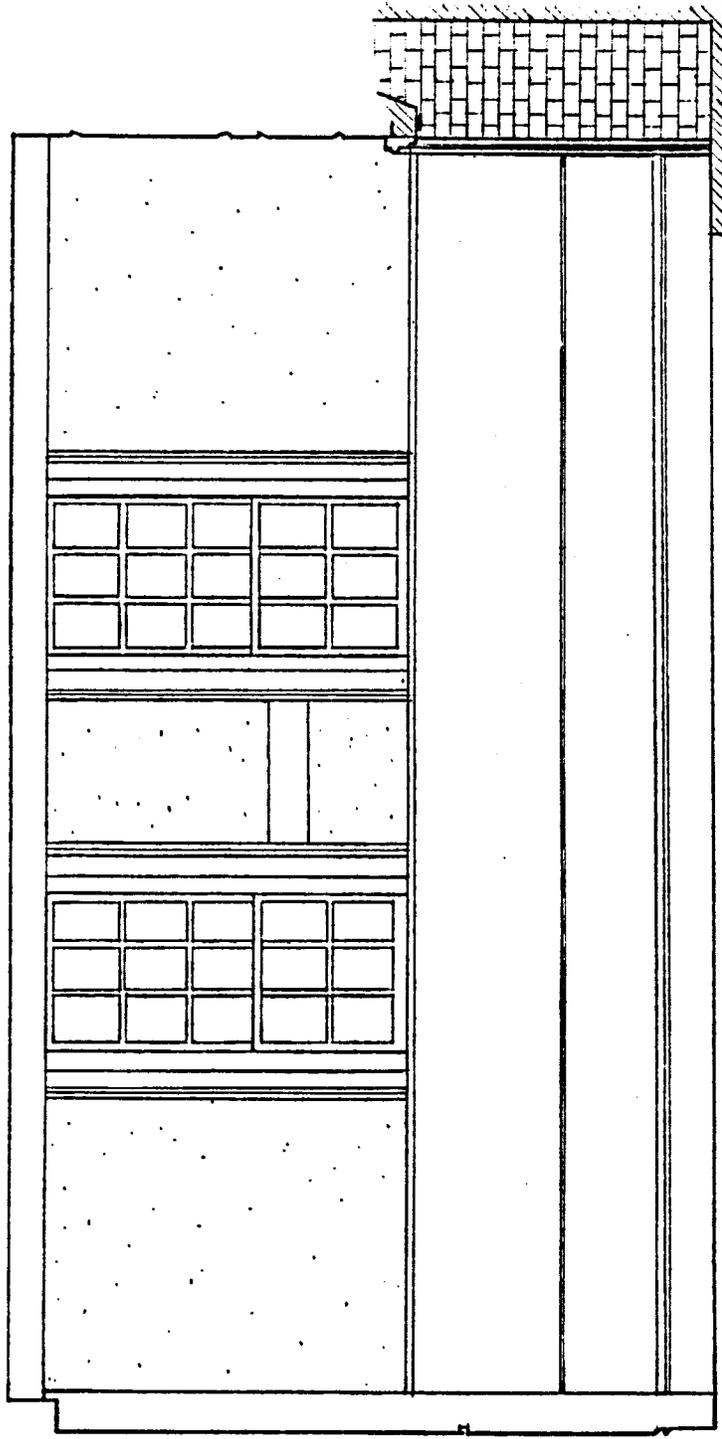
Atwood-Higgins House: East Front Room, South Wall.
